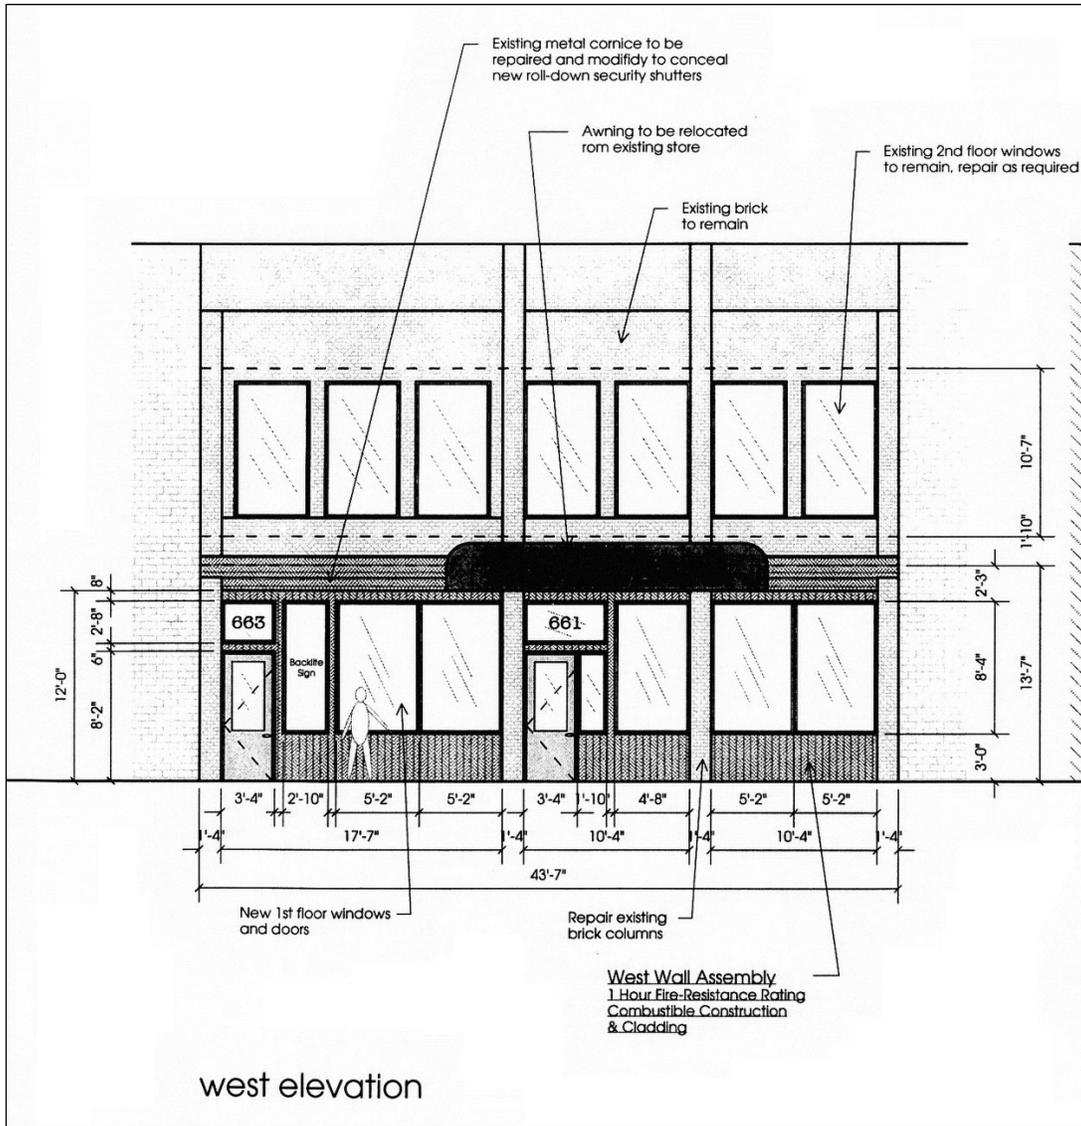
Architect’s Plans #111116/2008, “West Elevation”. (City of Winnipeg.)
